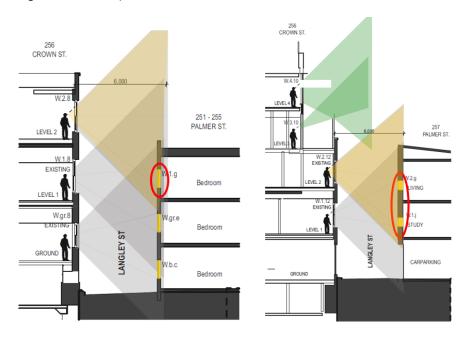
Overlooking impacts from widened windows W2.8 and W2.12 to No. 251-244 Palmer and 257 Palmer Street (yellow cone)
